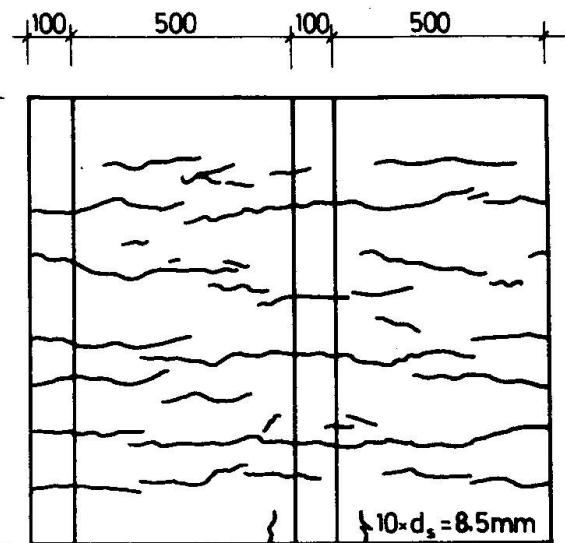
Crack pattern of reinforced concrete panel B 11 ( $Q = 0,6 \beta_c$ )
